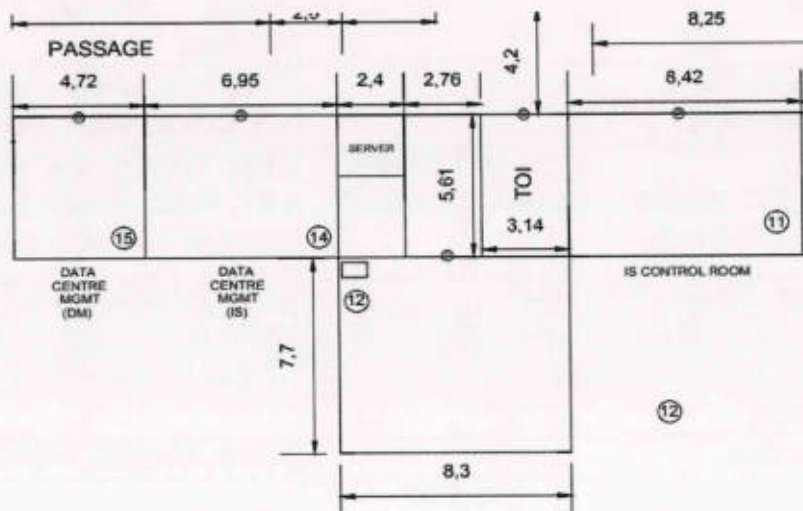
Floor layout / Plan with furniture for ICR ER at North Block (Room no. 11 & 12)
